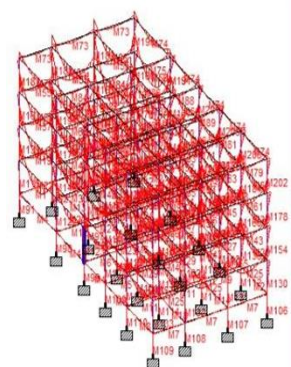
Bending Moment analyses of Structural Beams and Columns
